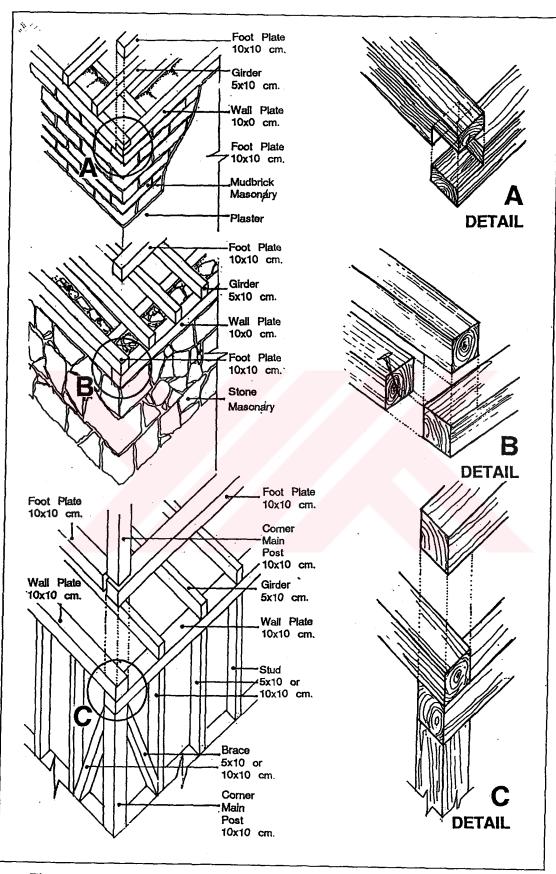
Connection Details Between the Masonry and Timber Framed Sections
